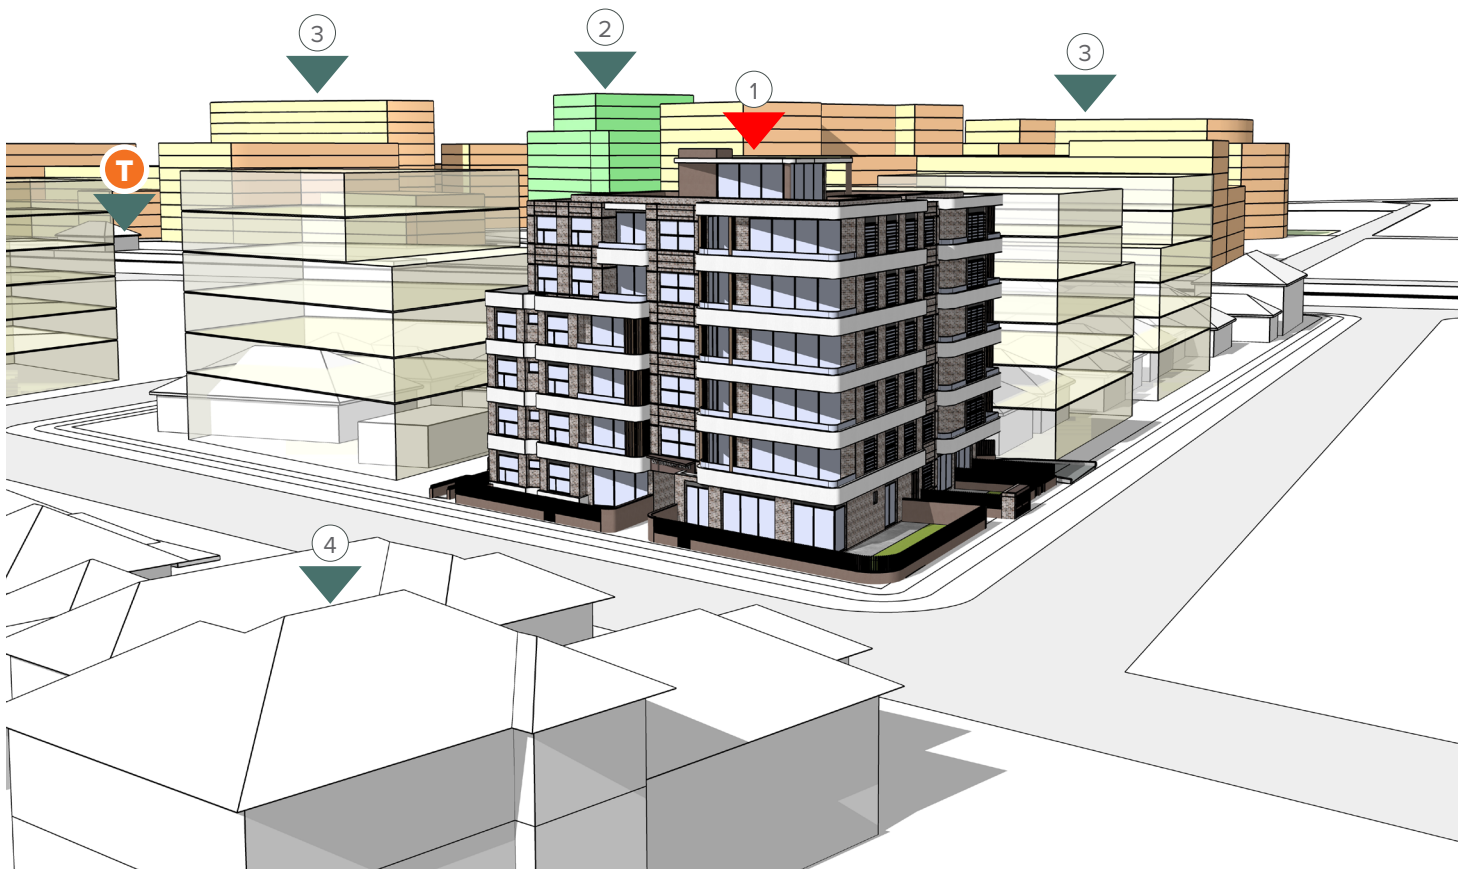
Proposed Future Massing Looking South, 15 - 17 Lupin Avenue (inc. Villawood Town Centre)
